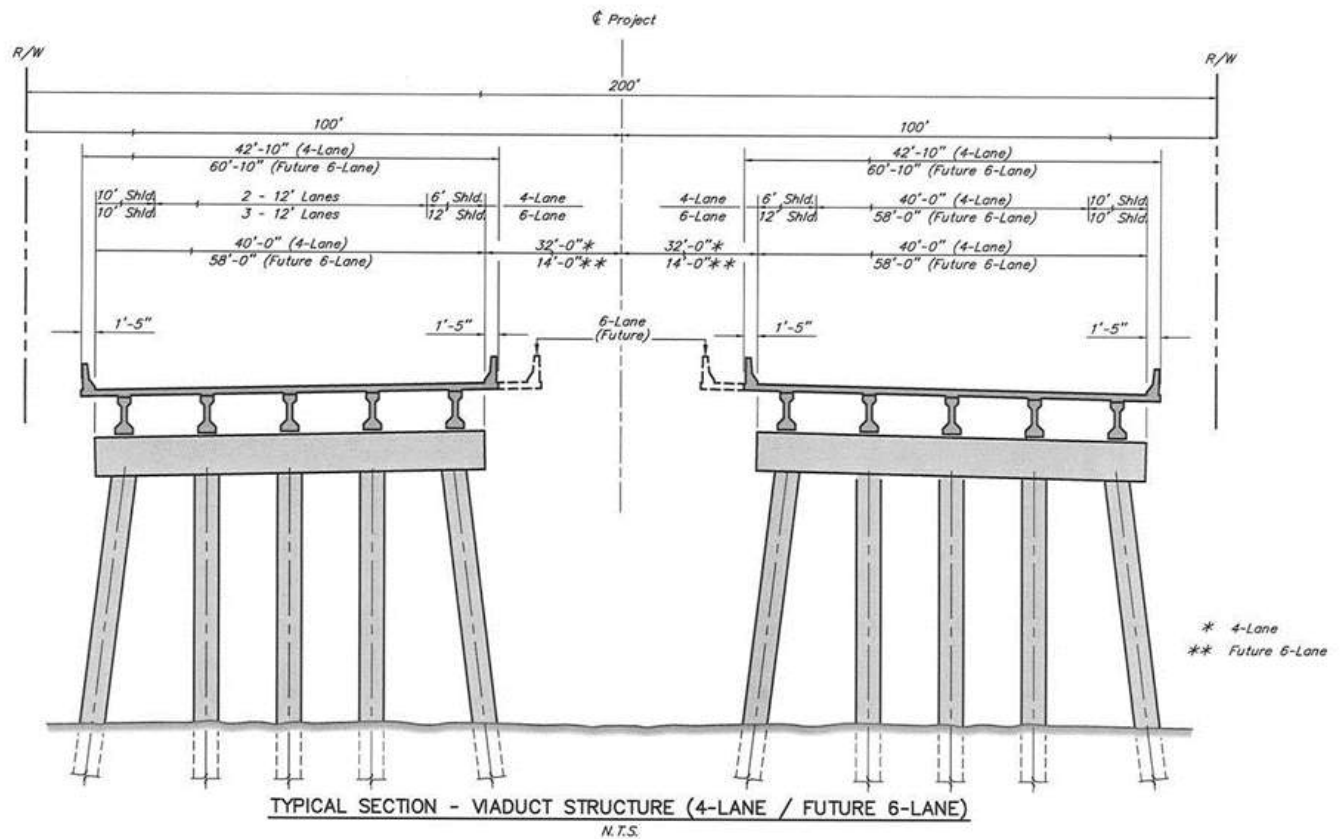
Proposed Typical Section of Bridge Structures along Westside Expressway (Source: Baton Rouge Loop Tier I EIS)
